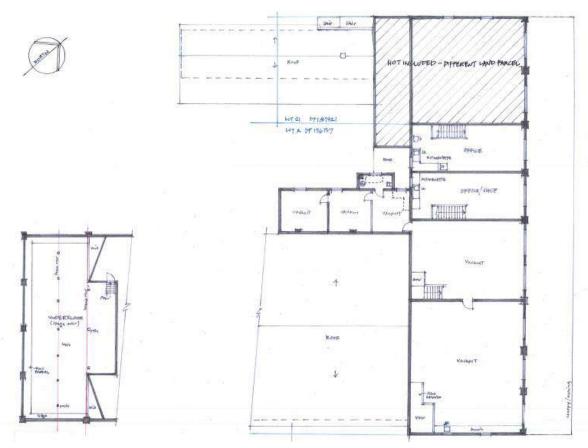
Understage & First Floor Plan for the Theatre Royal building - Noel Thomson Architecture
